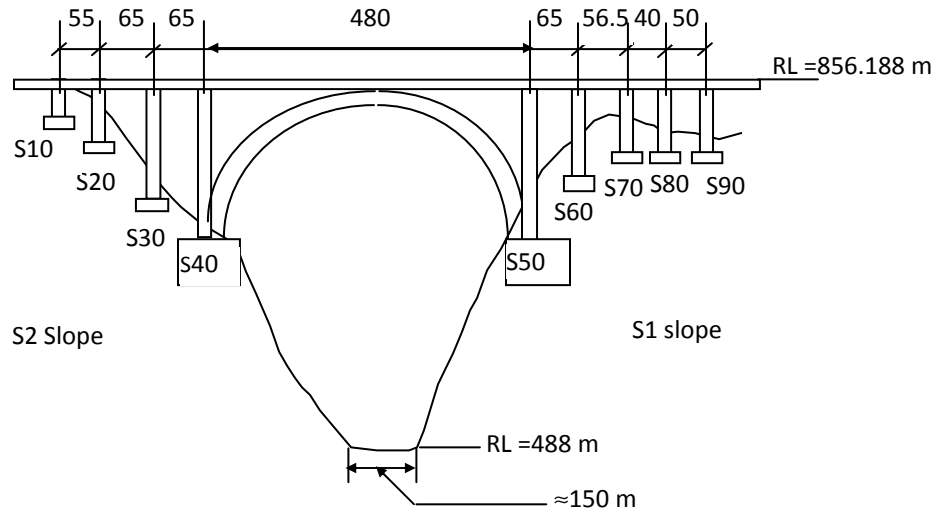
Bridge details and section of the gorge with pier foundations along the slope
